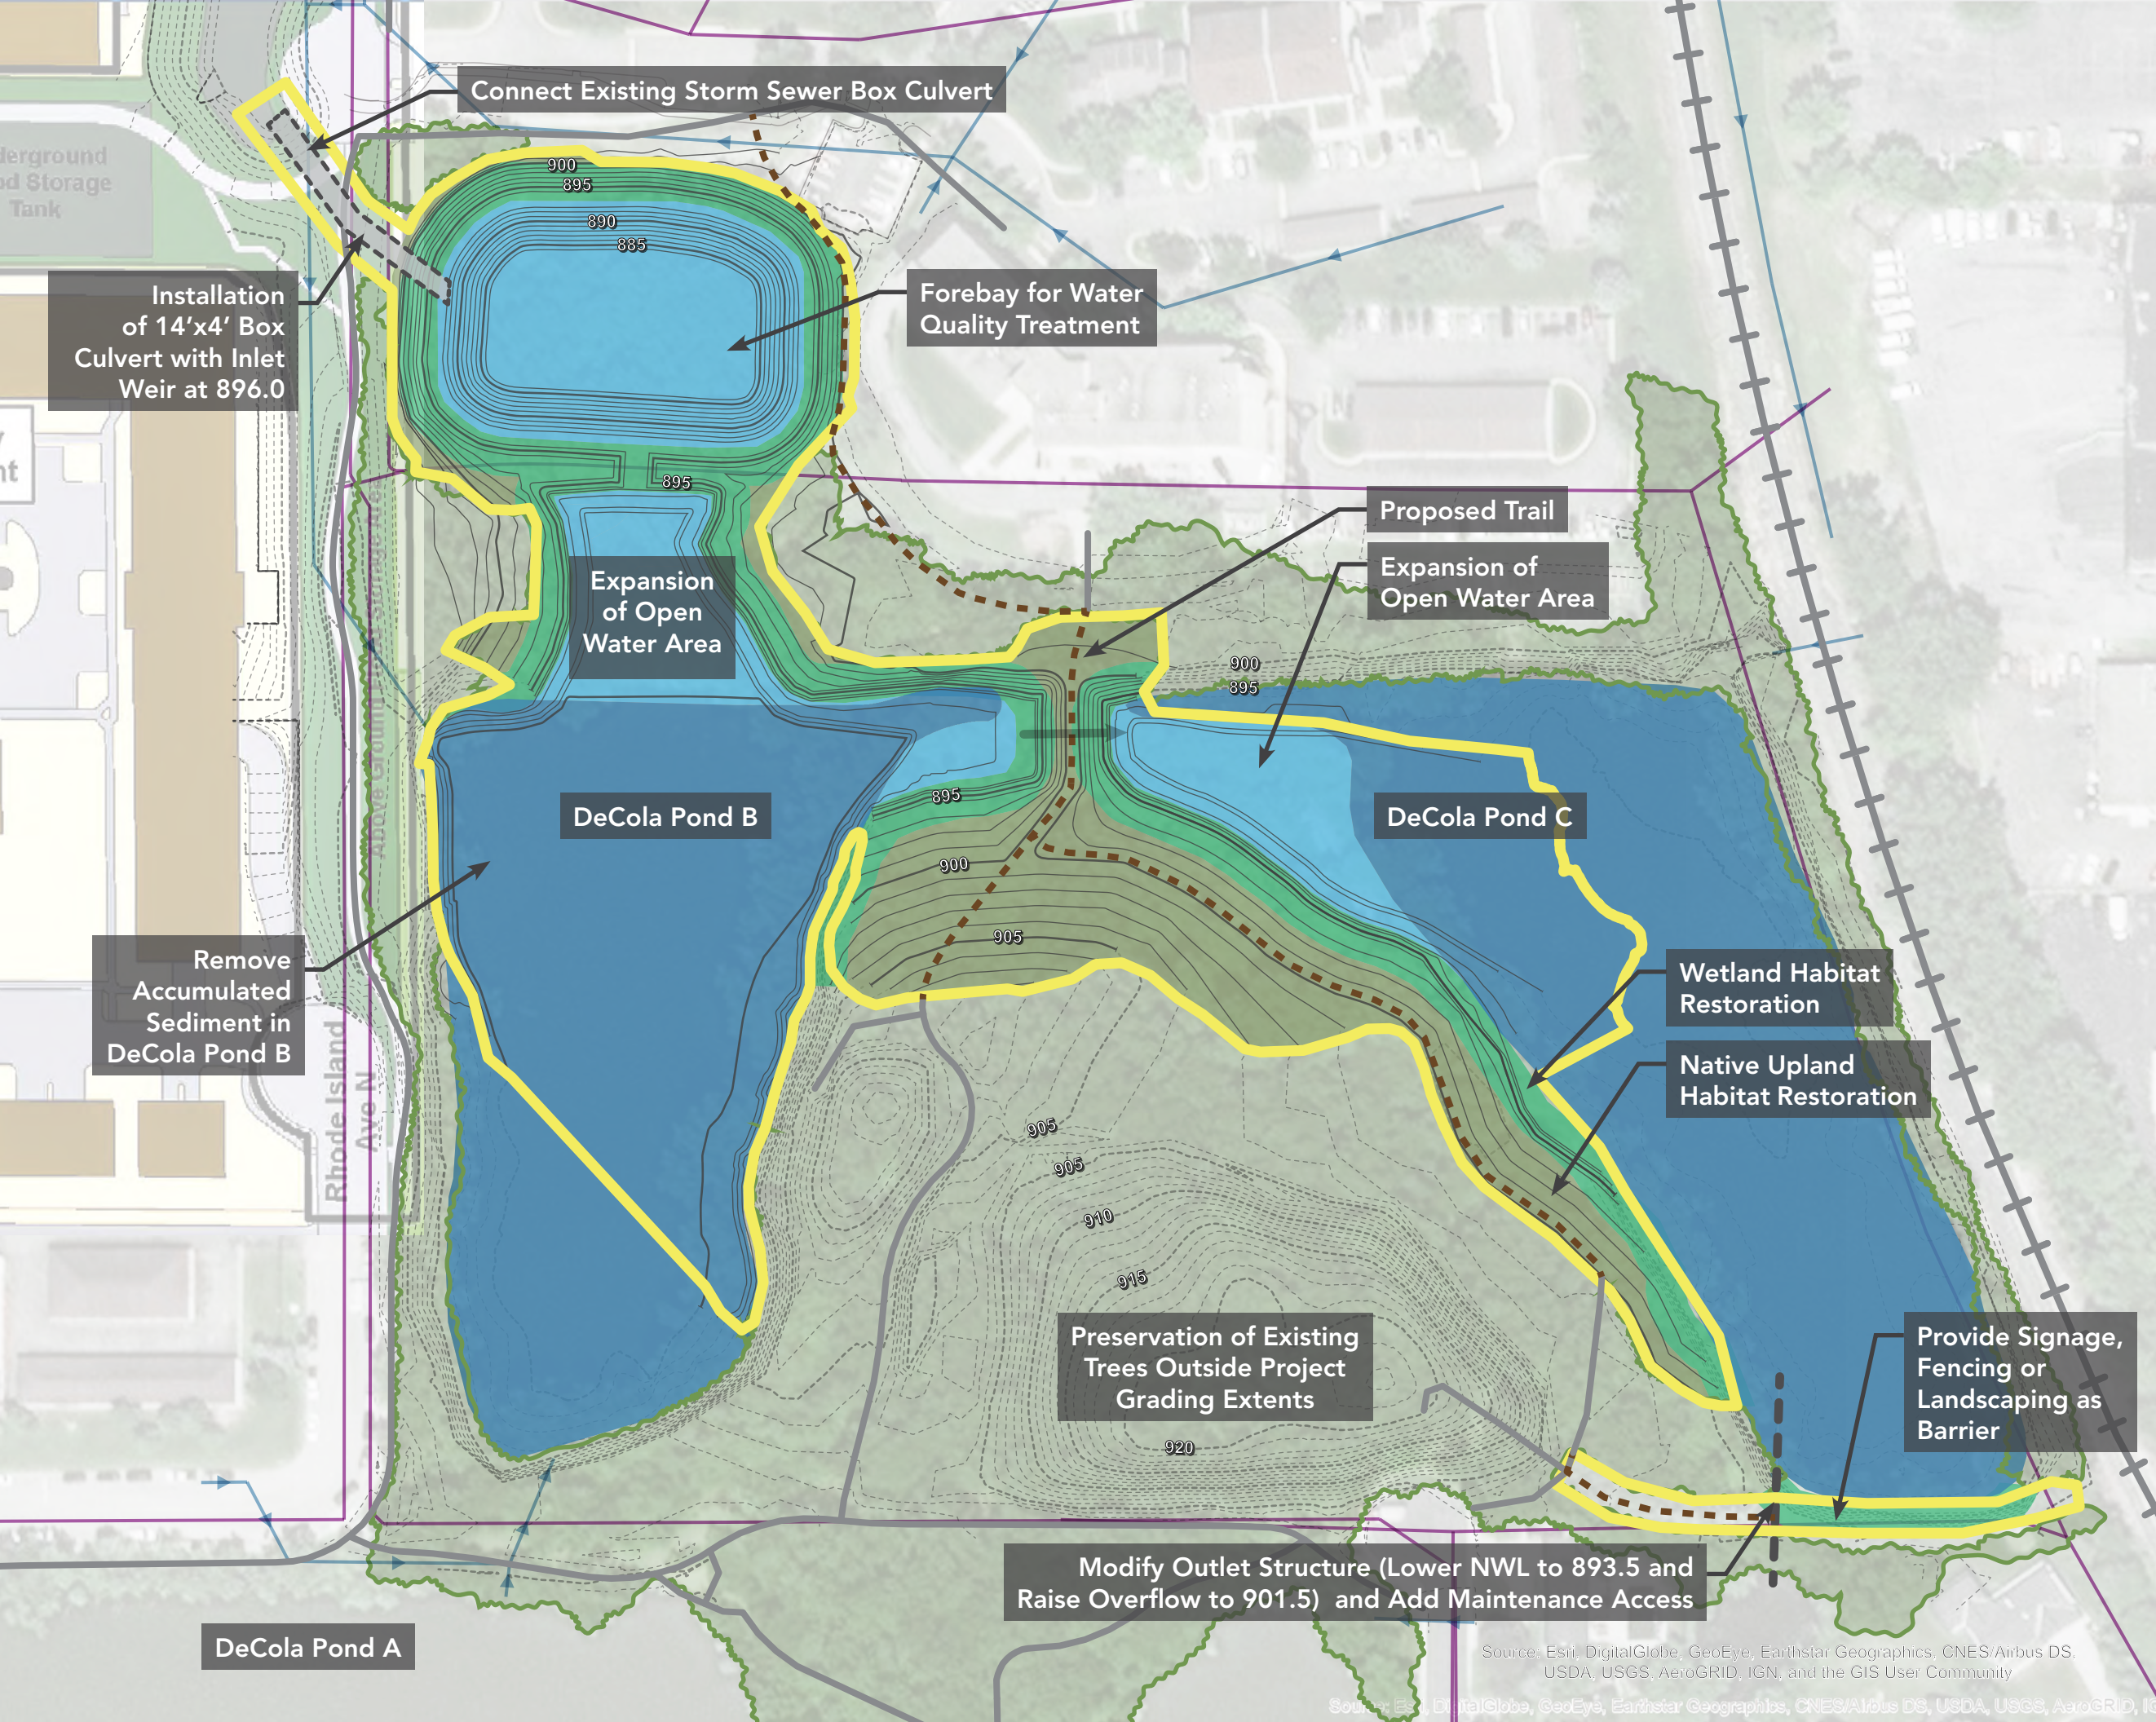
Proposed DeCola Pond C Outlet Structure
